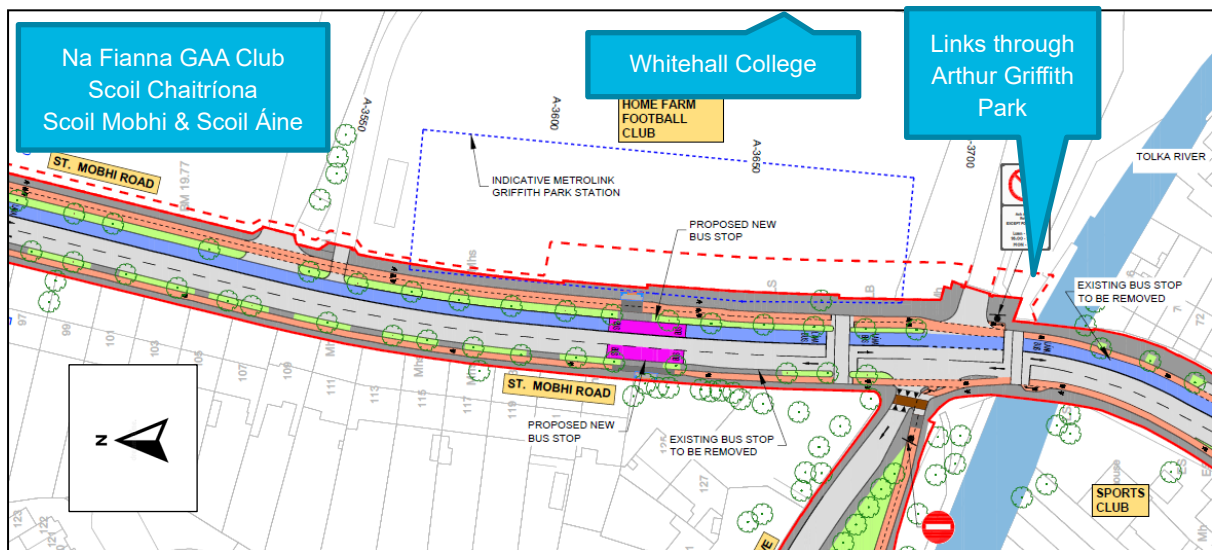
Extract from General Arrangement Drawing Sheet 8 at Junction of Ballymun Road and St. Mobhi Road
